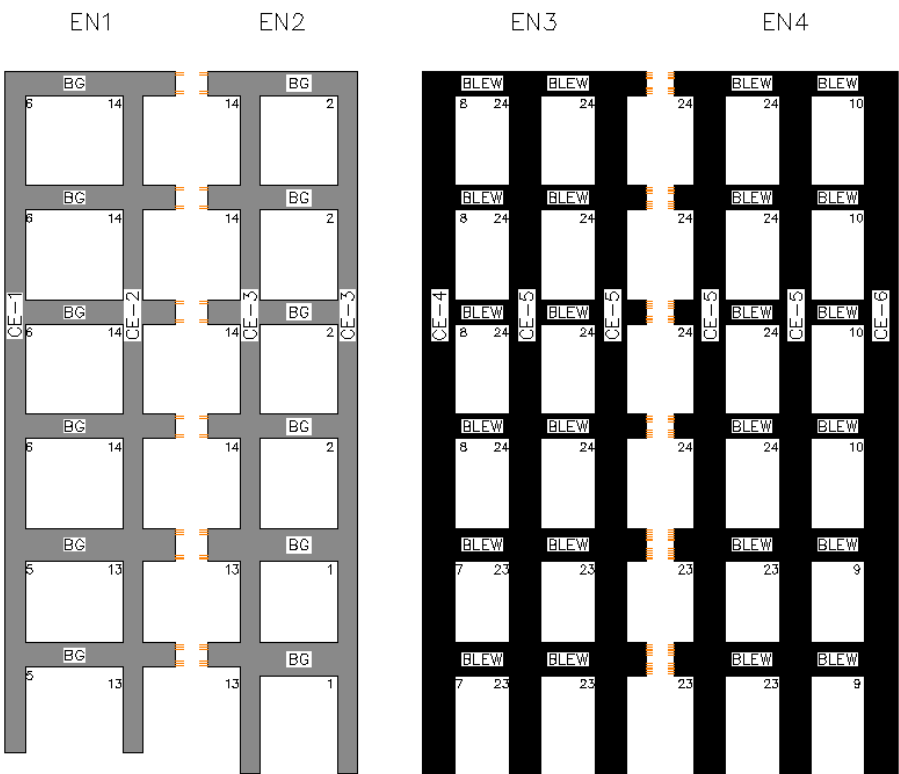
, Joint Locations and Respective East Tilt-Up Wall Panels Designations
